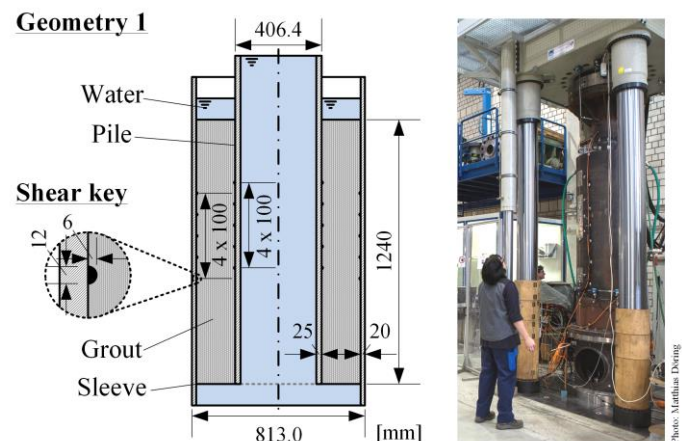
Geometry 1 of large-scale specimens (left) and specimen in test rig (right)
